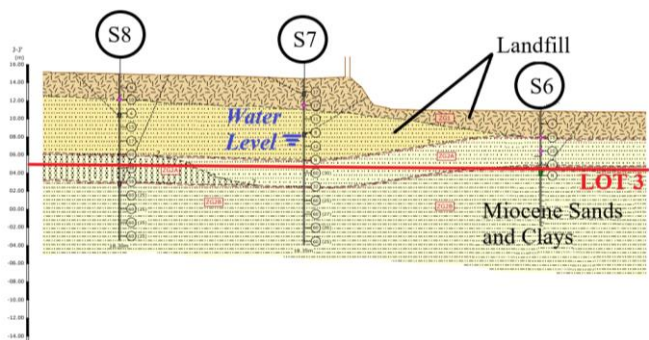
Site investigation geotechnical profile (Section Cut JJ' from S8 to S6 at lot 3)
